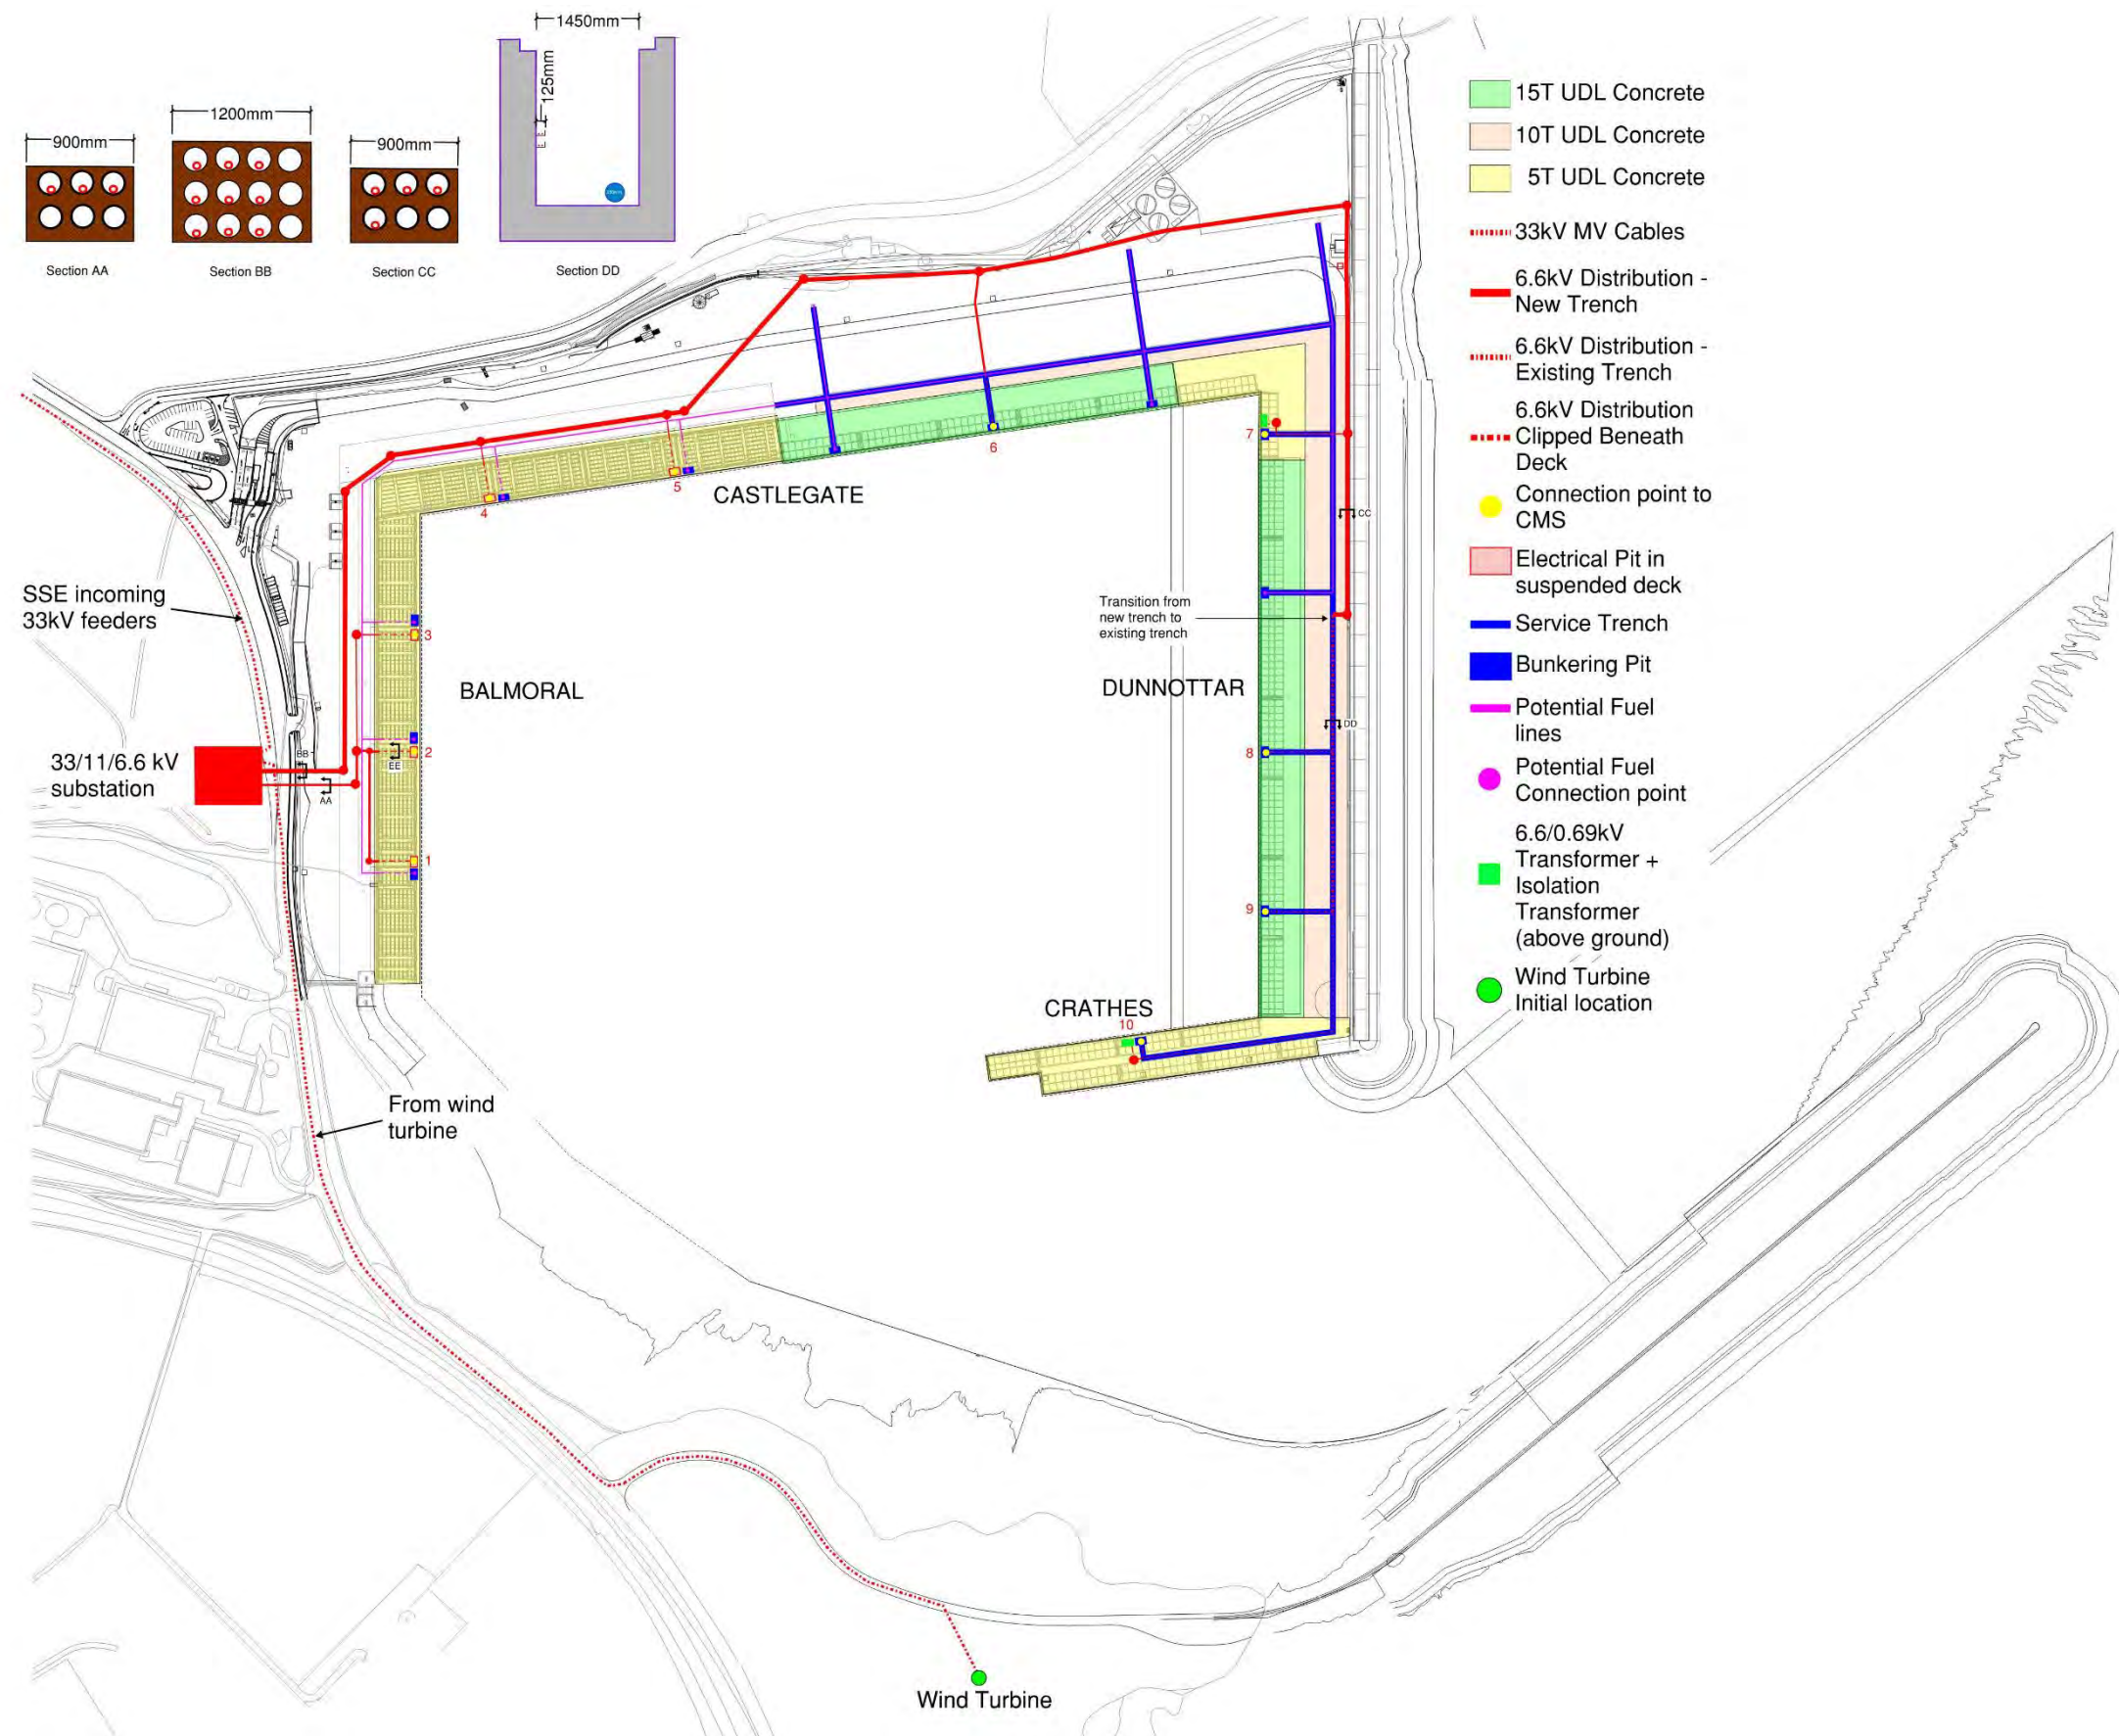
6 Proposed electrical infrastructure (stretch sitewide drawing)
